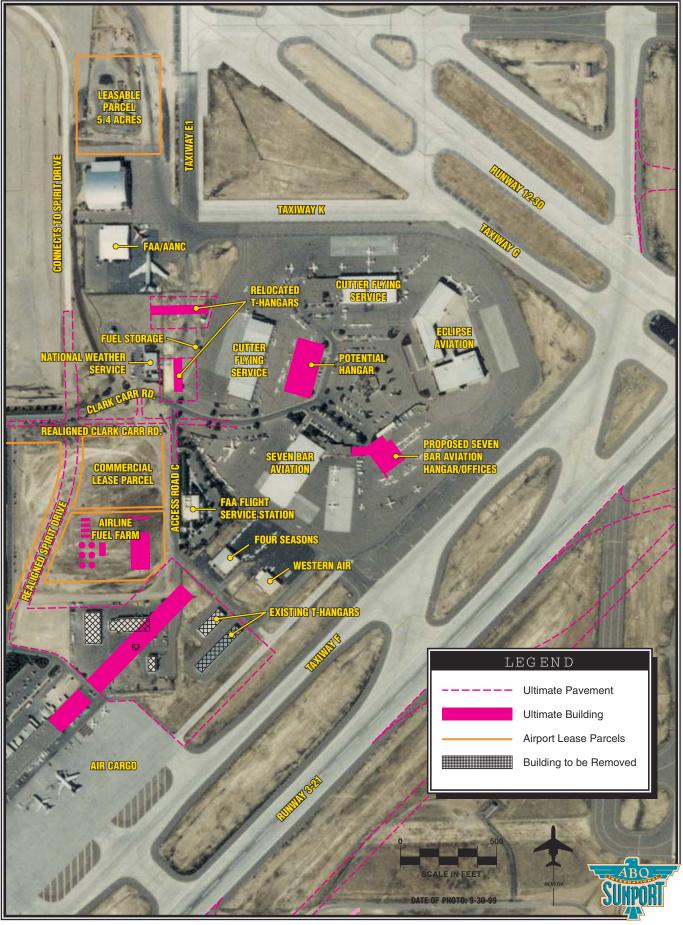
RECOMMENDED GENERAL AVIATION PLAN
